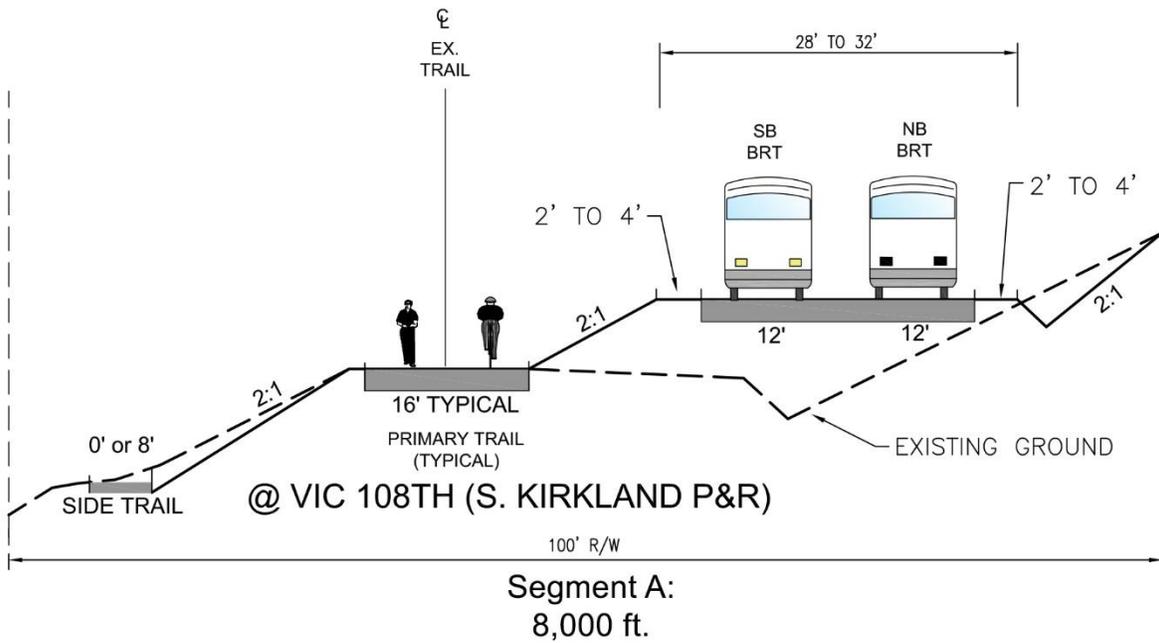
Typical cross section in South Kirkland Park & Ride to NE 68th Street segment
